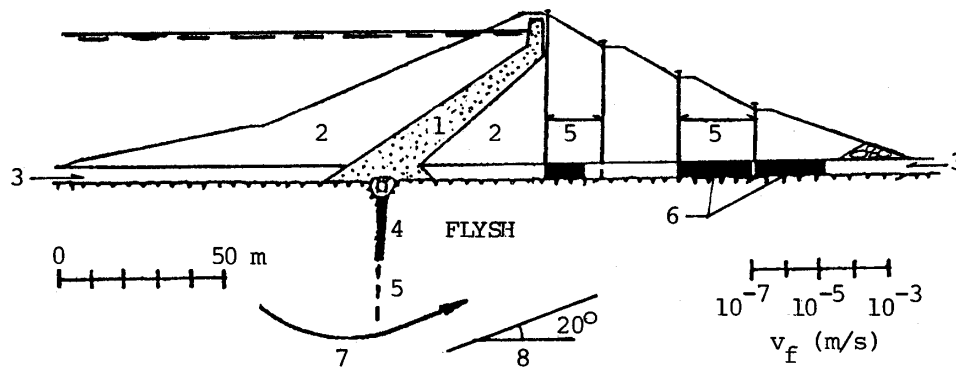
Cross-section of the Liptovská Mara dam: 1 – silt core, 2 – gravel, sand, 3 – alluvial deposits (gravel), 4 – grout curtain, 5 – observation boreholes, 6 – filtration velocities (v_f), 7 – curtain underflowing, 8 – fissures declination.
